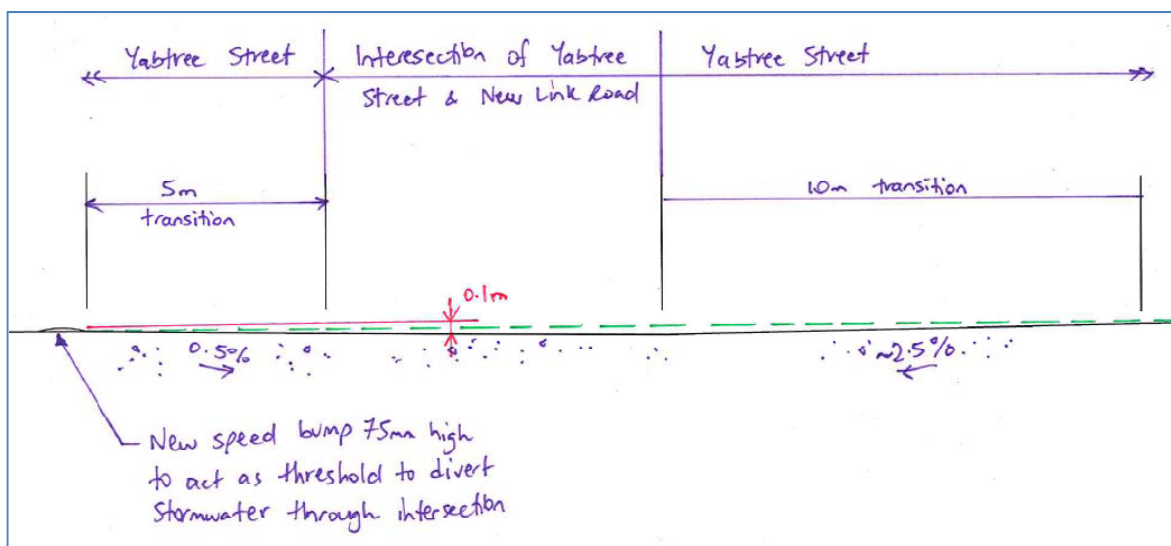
Elevation through intersection of Yabtree Street and New Road.
